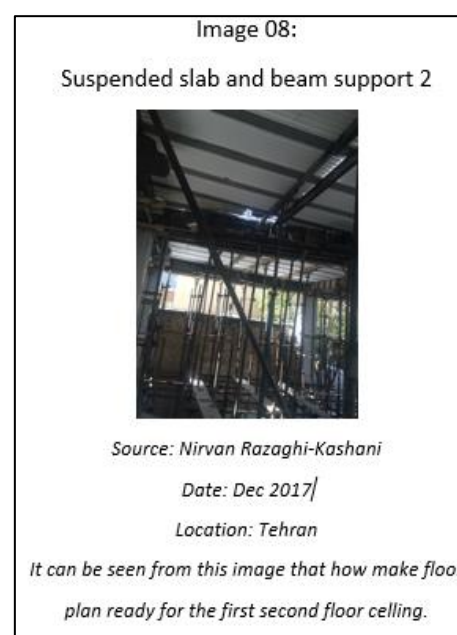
Images of support to suspended floor in Tehran, source (Nirvan Razaghi-Kashani).
